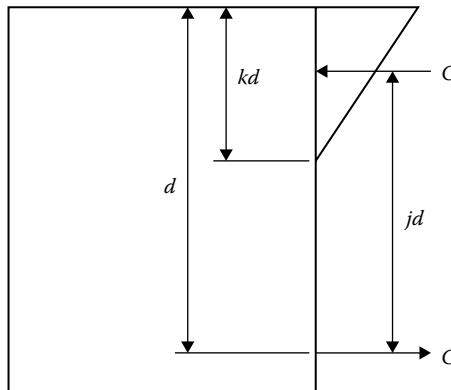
Beam stresses at service limit state for reinforced concrete section.
